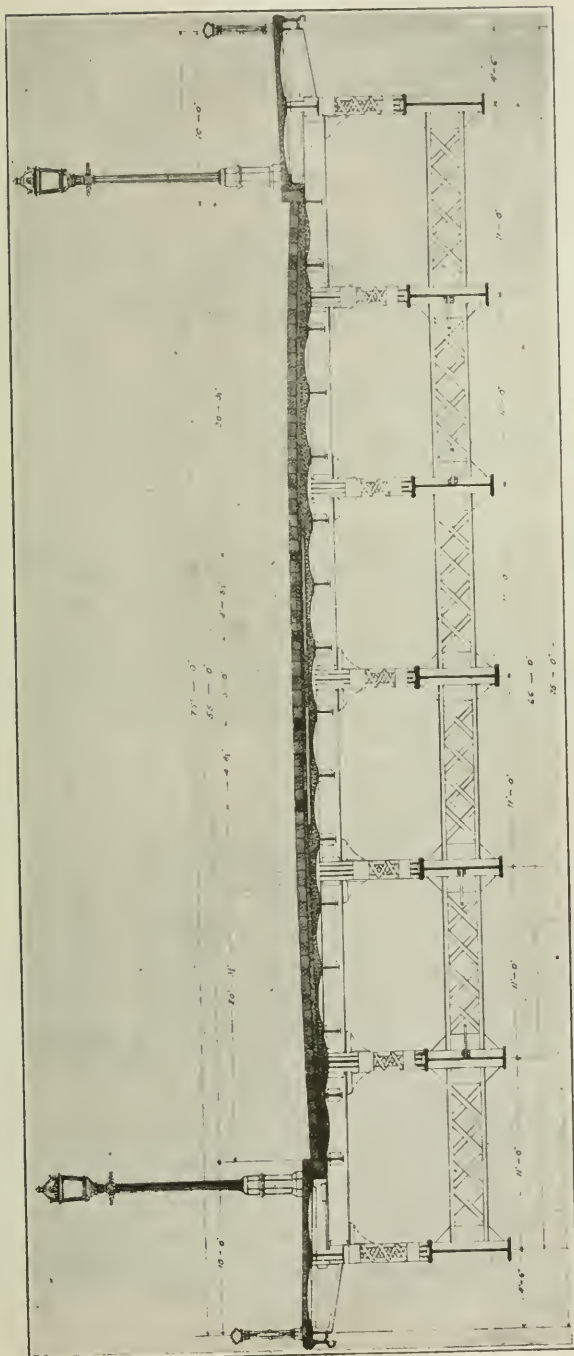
Typical Cross Section Showing Proposed Cambridge Bridge Without Elevated
